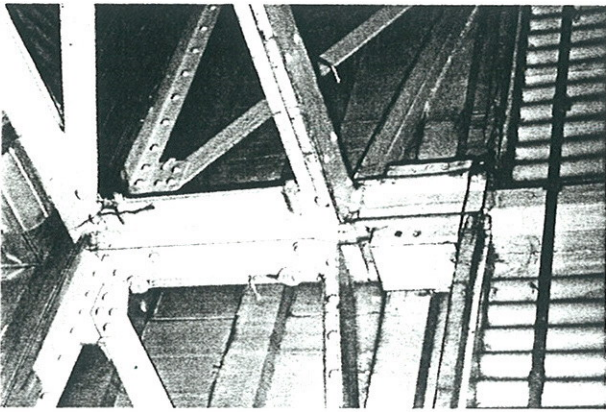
Secondary B2 wrought iron side beam supporting deep secondary type T3 truss. Contemporary infill panels behind. Note the former gutter flanges on the C2a & C2b type columns and how the deeper design of side beam would have precluded the continued use of a valley between these flanges.
